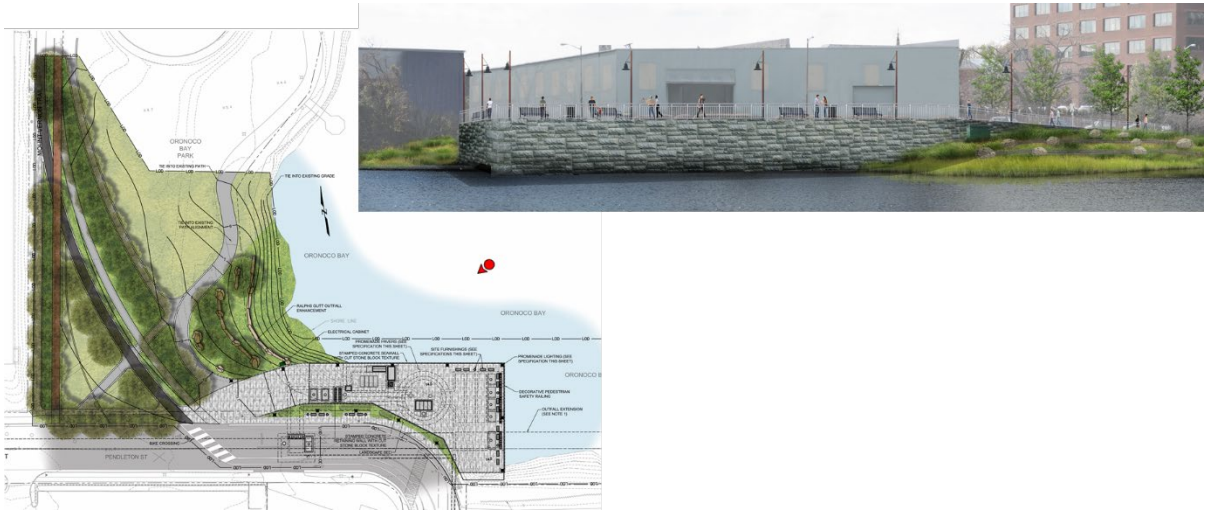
OBE Alternative Conceptual Landscape Plan and Rendering
